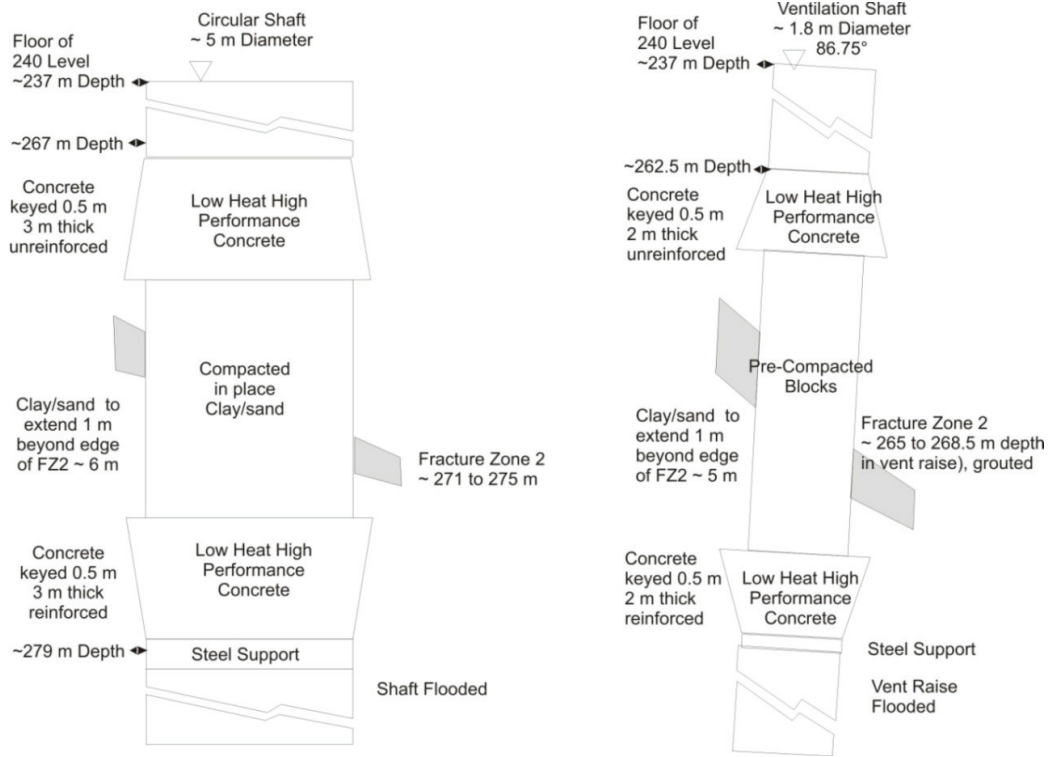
Configuration of installed shaft seals used to isolate the shafts from fracture Zone 2 at the AECL URL.
